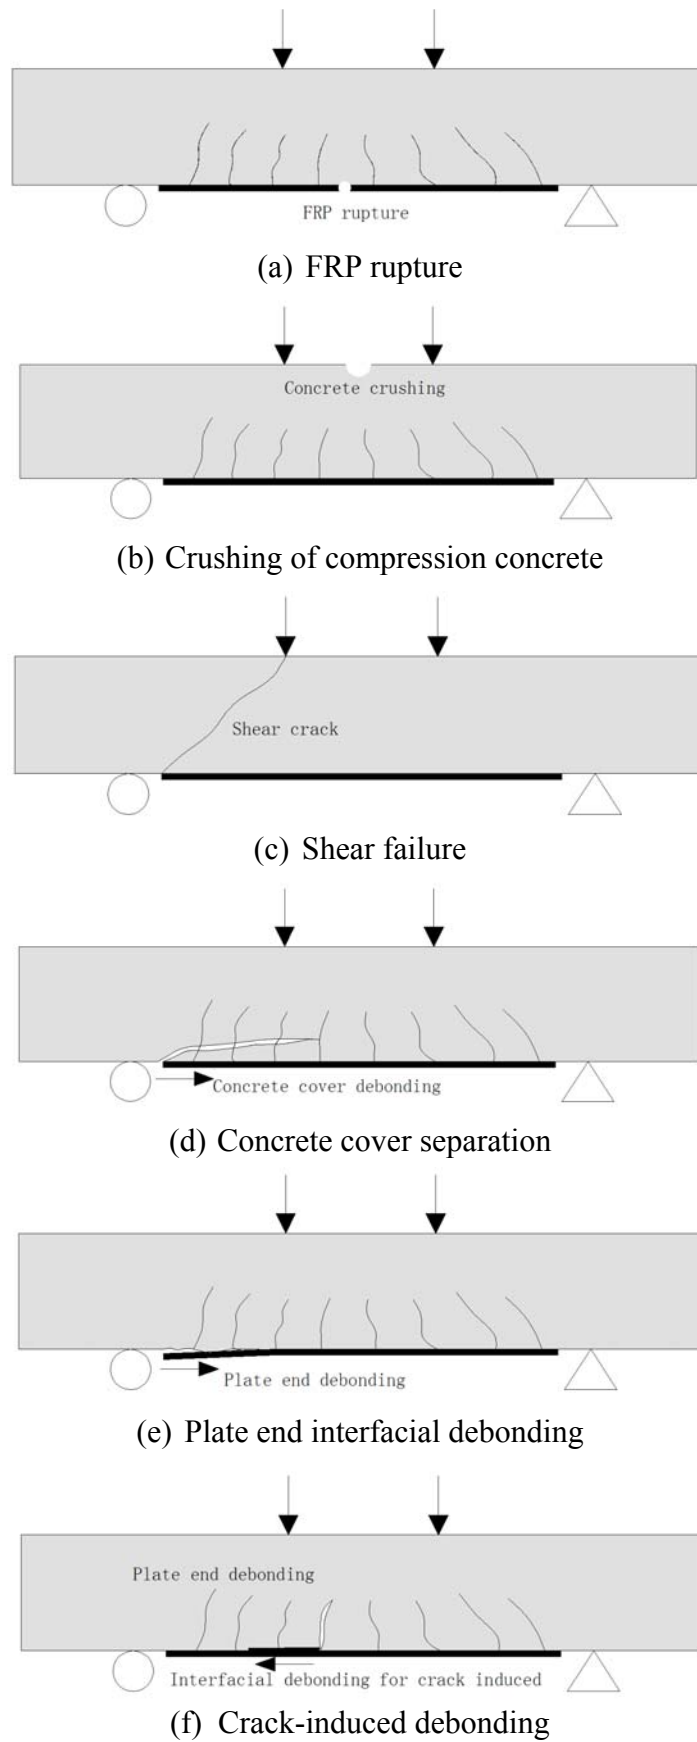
Possible failure modes for FRP-strengthened RC beams
